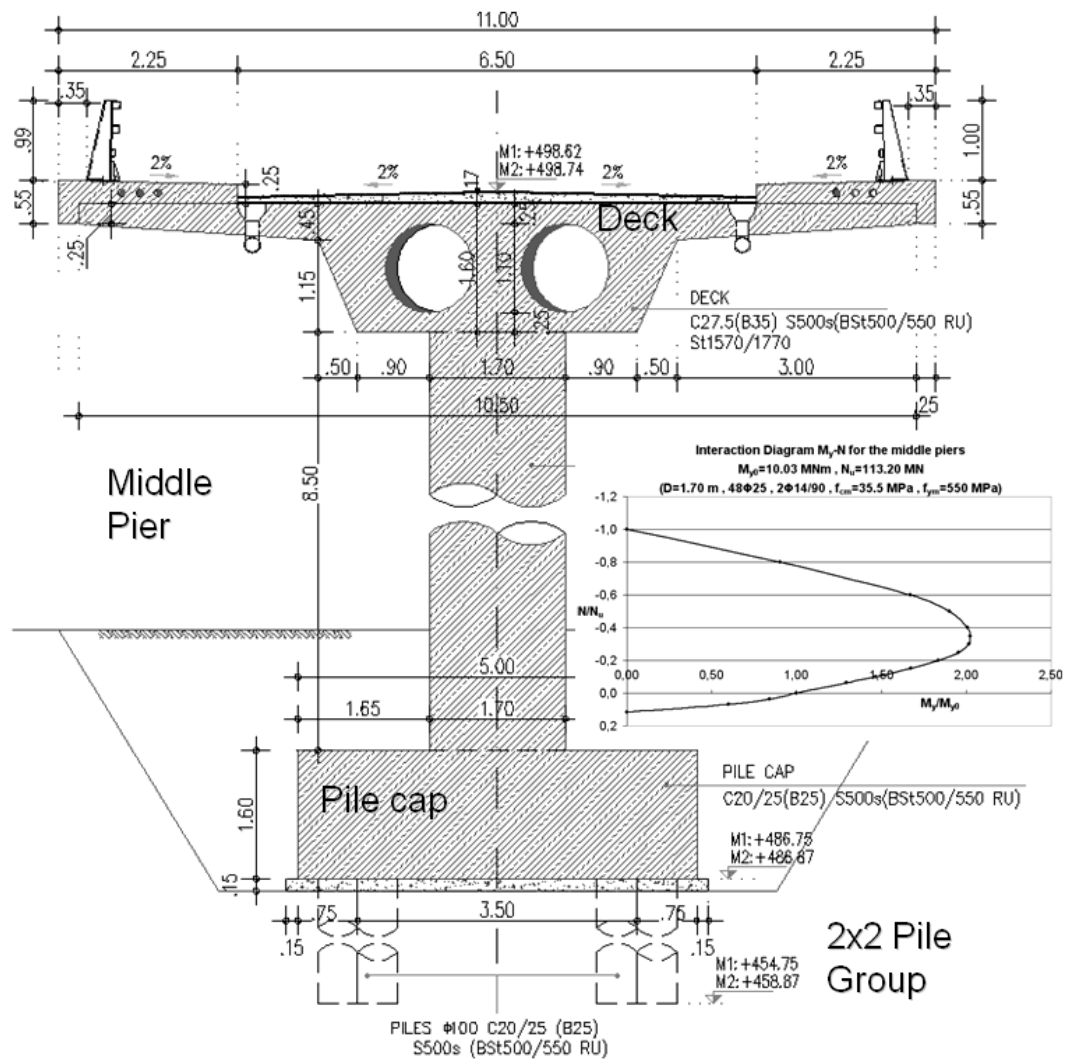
Overview of the foundation-pier-superstructure system cross-section (Piers M1 and M2)
